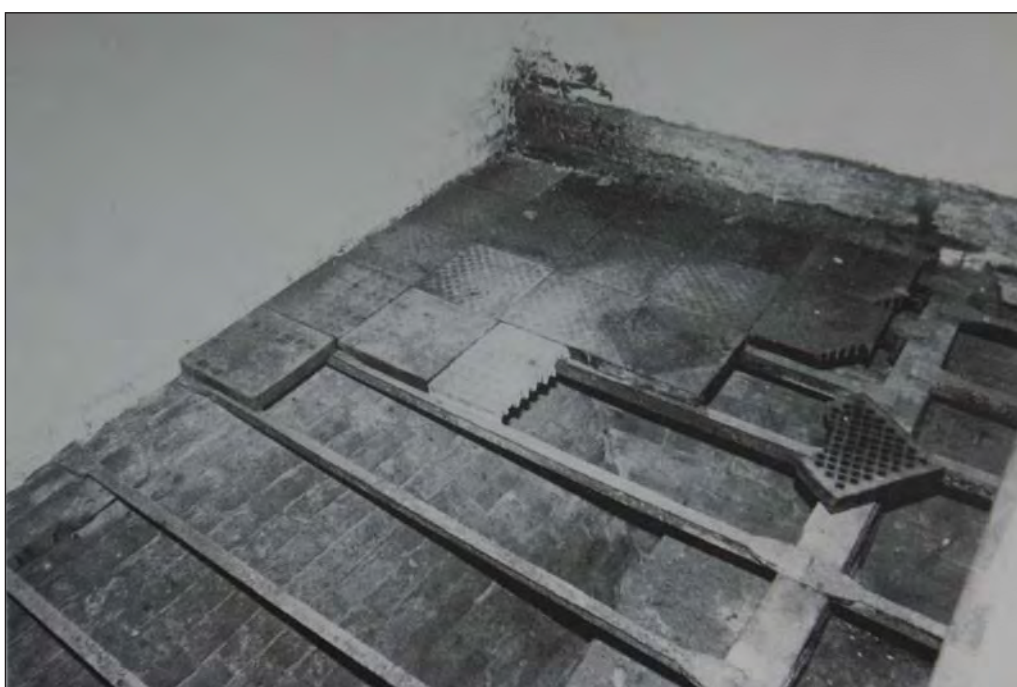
Kiln Floor with Wrought Iron Joists and Perforated Clay Tiles (Bunburt Mill, Cheshire). After Watts 1983: 18.
